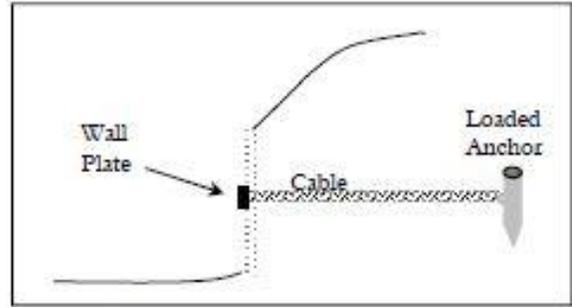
B. An earth anchor is driven into the soil and once the driving rod is removed the anchoring rod/cable is pulled to pivot the anchor into a load-lock position.
